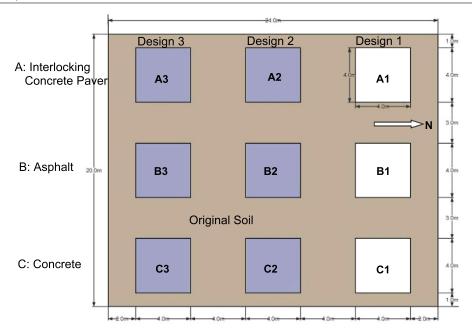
Schematic view of experimental test sections at the UCPRC facility (six permeable pavement sections shown in shaded area, i.e. left two columns) (adapted from [41]).
